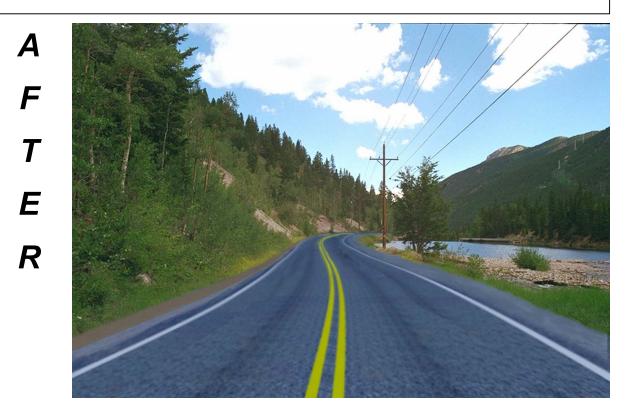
Station 38+320 Rehabilitation and Light Reconstruction, Paved Surface Third Switchback Above Georgetown
